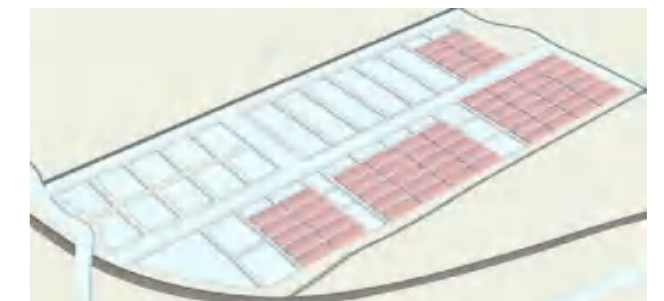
Proposed PV installation plan for Xuwang Aquafarm
